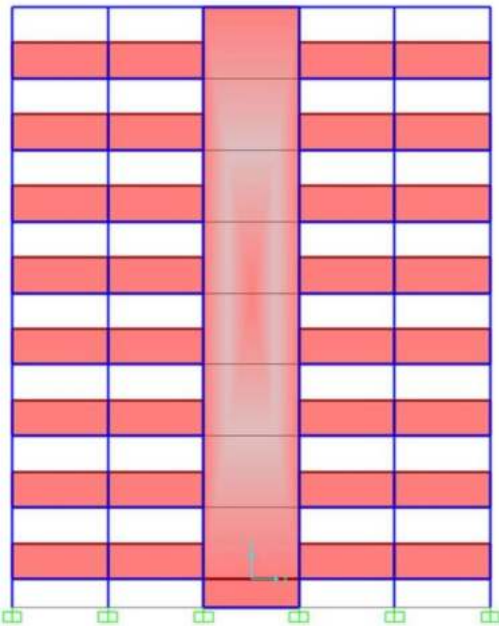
Elevation of 50% Partially in-filled frame with shear wall
